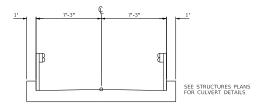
## DETAIL "A" - JIM MCCRAY RD PAVEMENT DESIGN
